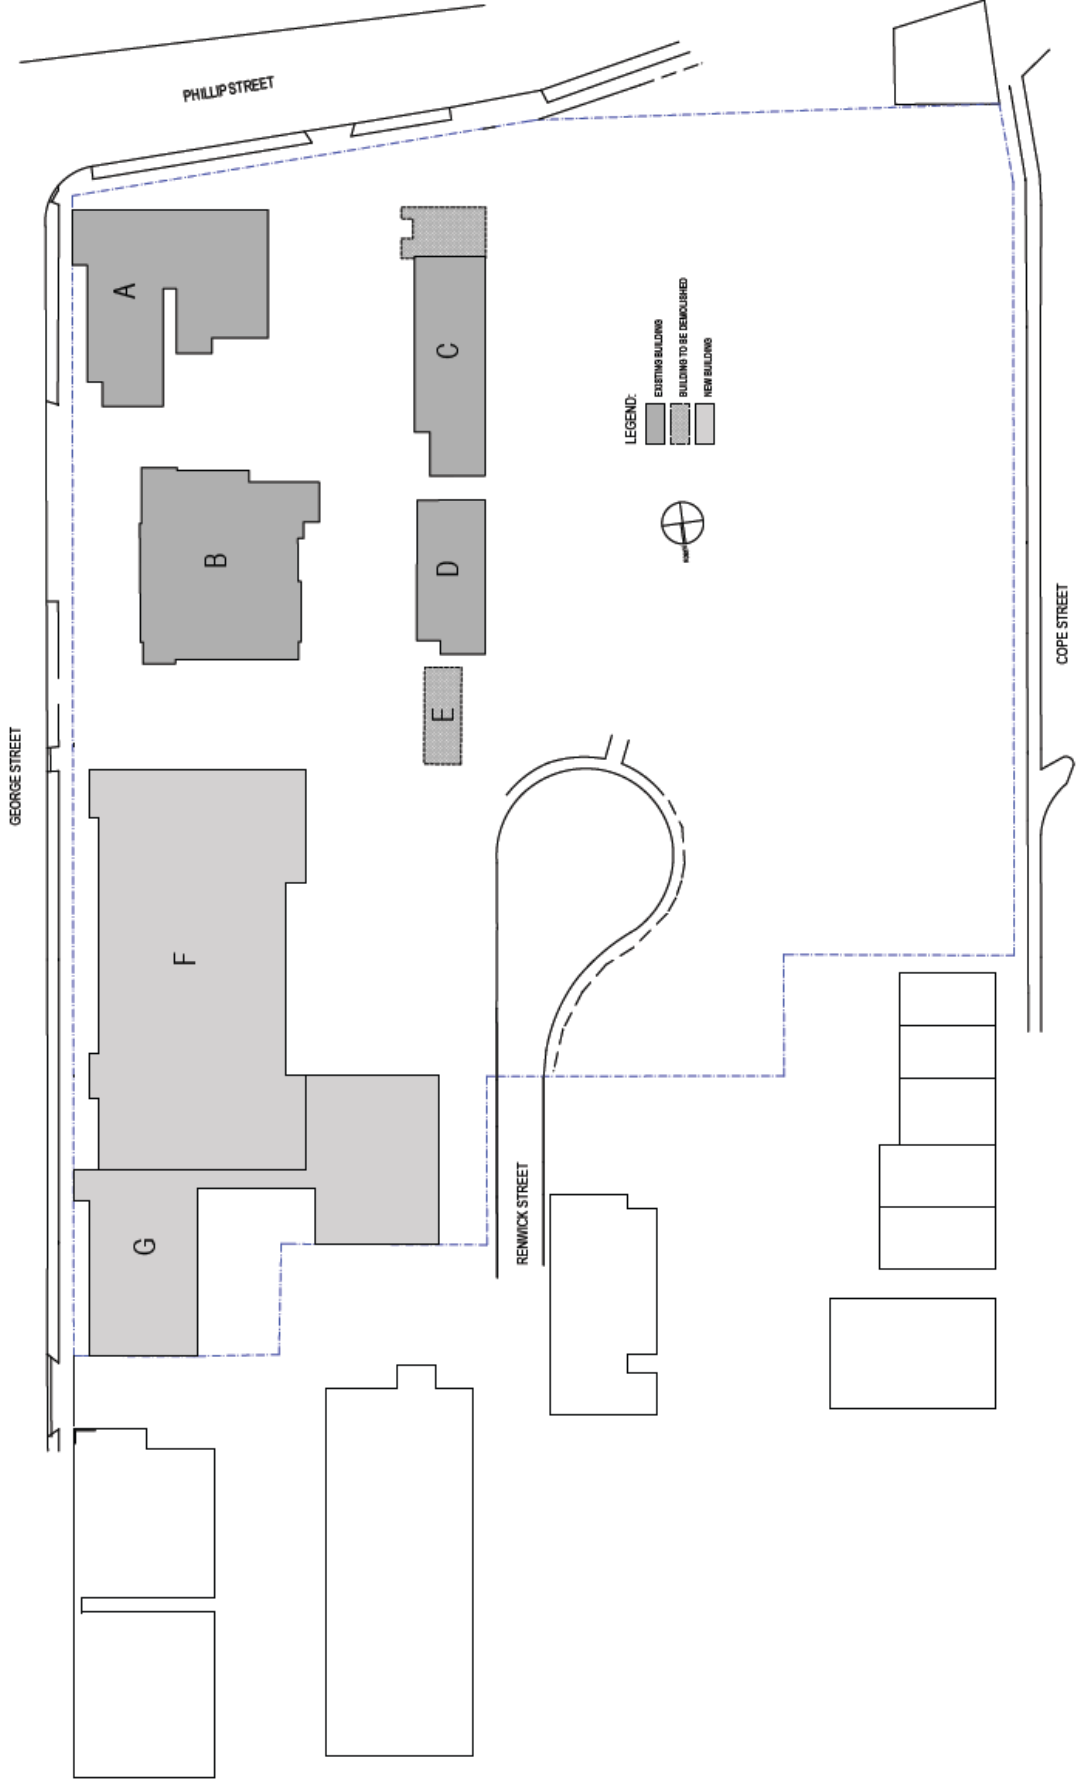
identifies existing buildings on site and refers to them as Buildings A, B, C, and E with the new proposed buildings shown as Buildings F and G. Buildings are referred to by these names throughout this report.
